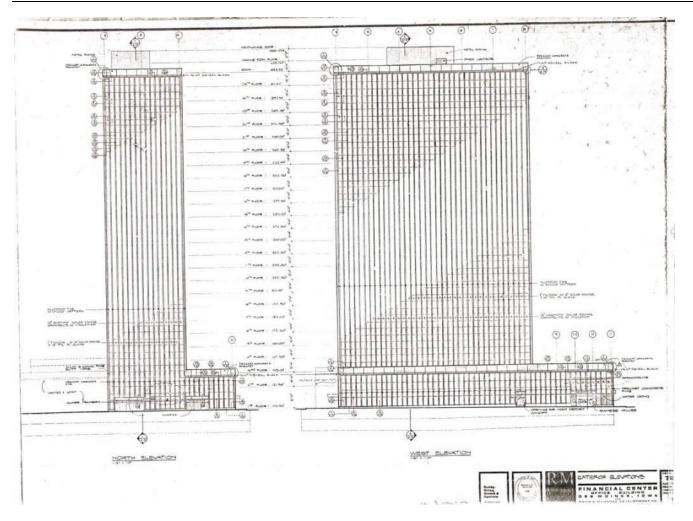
Historic drawings of Financial Center north and west elevation curtain walls with solar-shielding fins, scan of drawing cuts off date. (Financial Center Office Building drawings, Russell McCaleb, architect, Guirey, Srnka, Arnold & Sprinkler associated architects).
